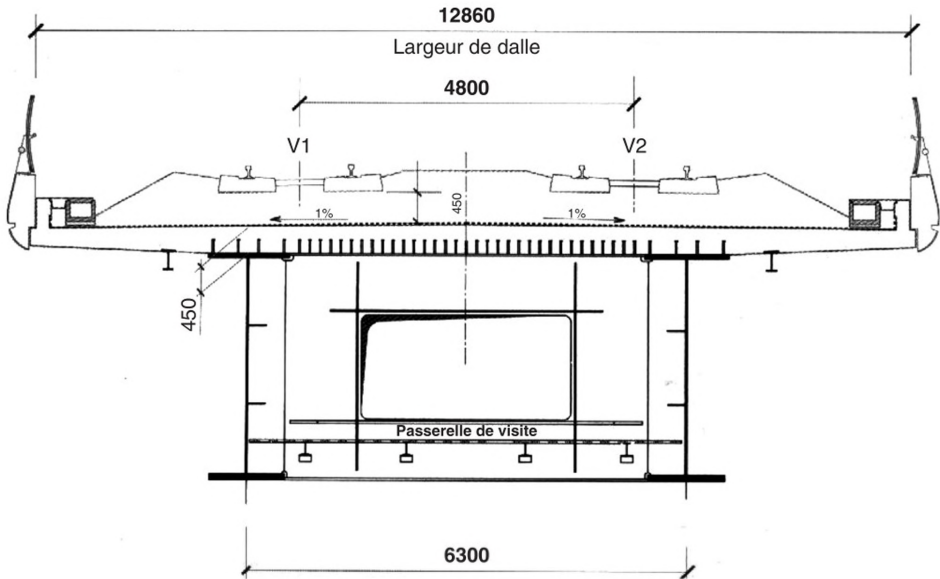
Classic French twin-plate-girder cross section for H.S.L.
